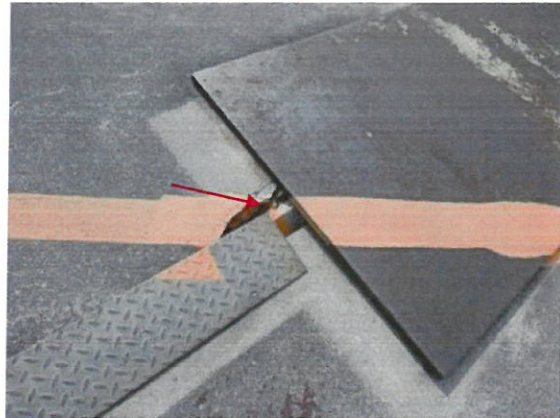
Full depth concrete spall at expansion joint on roof level
